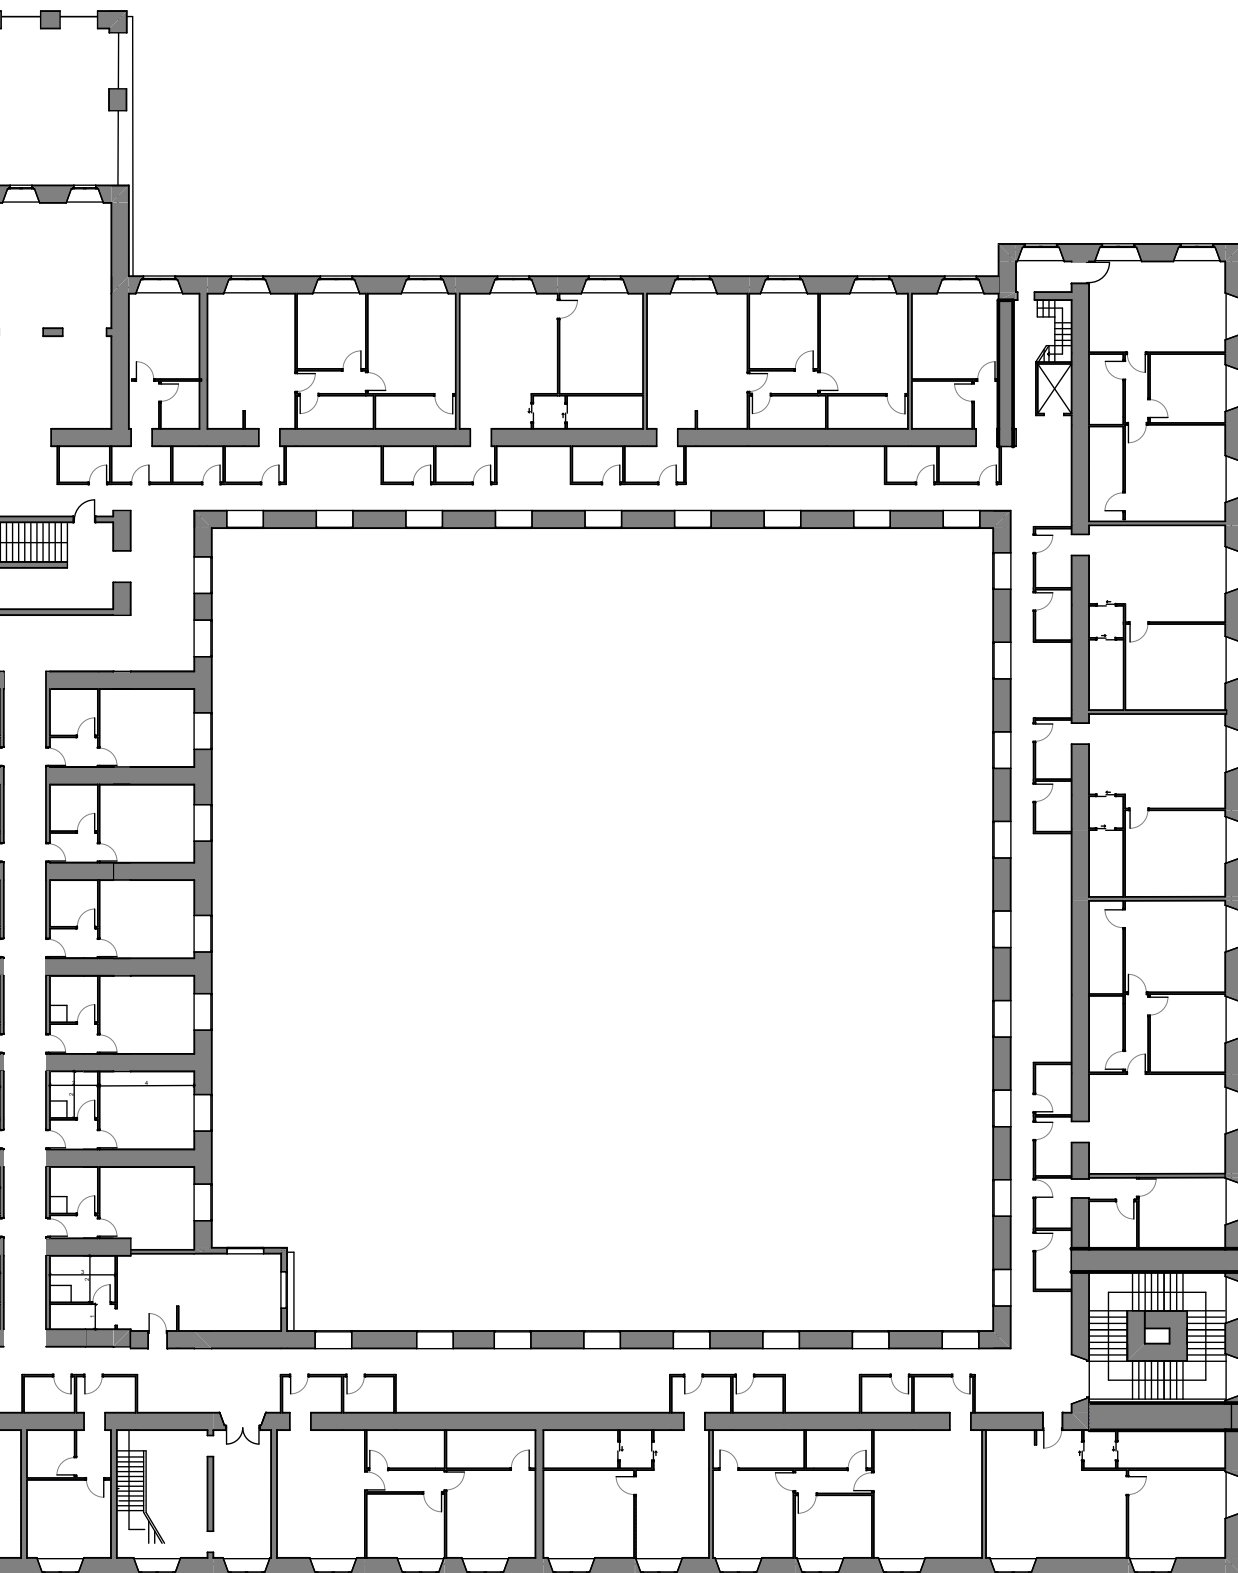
Floor plan of the first floor of the Chiarugi pavilion.
